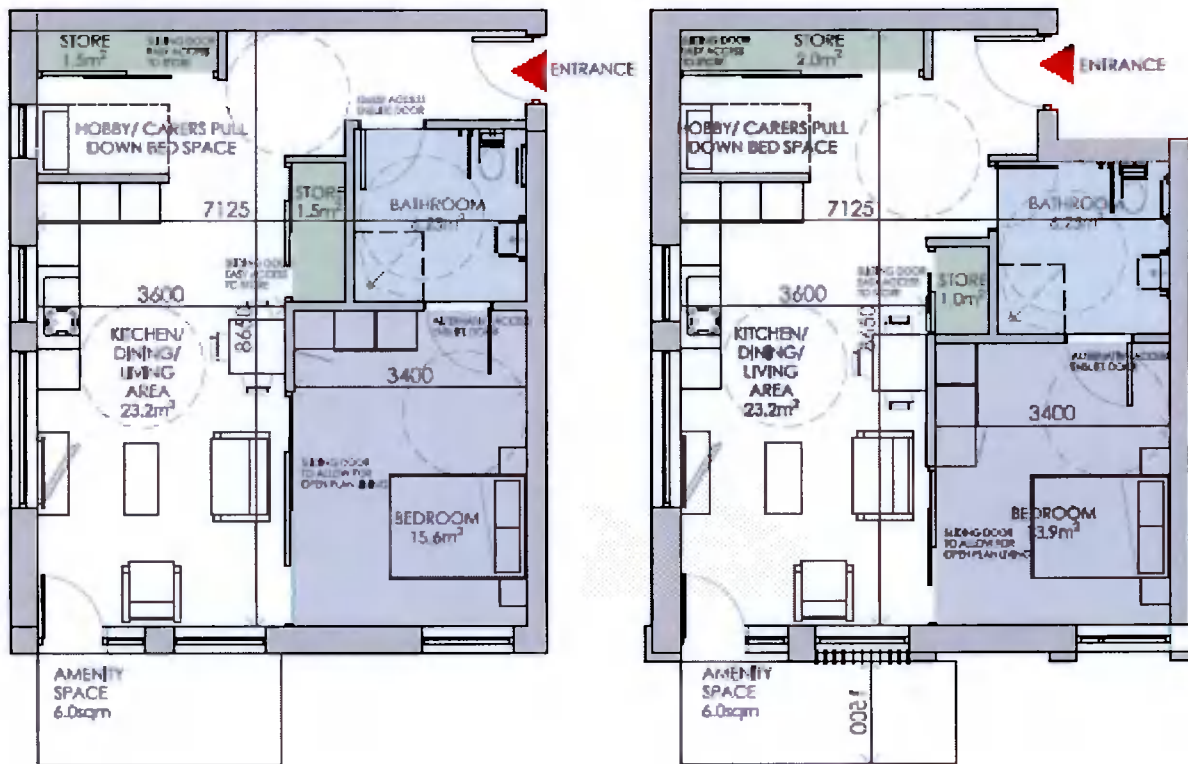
Typical ground floor plan of the independent living blocks House Type 1 (left) and 2 (right).
